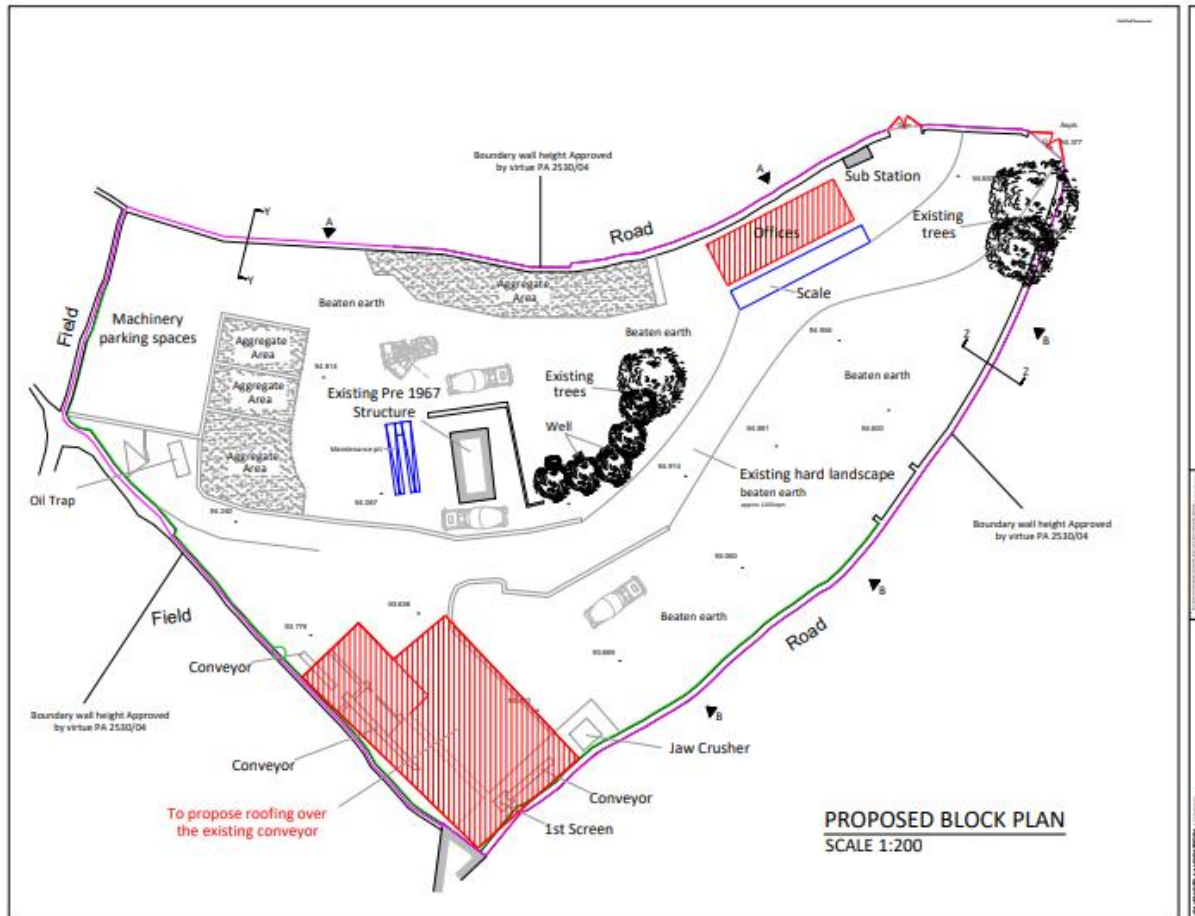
Proposed block plan of whole site (Source: E-apps doc. 63b)
